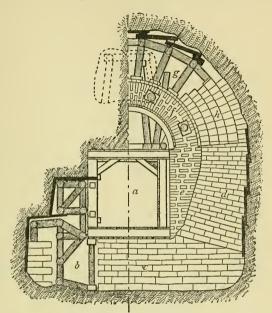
CROSS SECTION SHOWING STAGES IN CONSTRUCTION OF TUNNEL AT 4,400 KM., OR 2 MILES 1,292 YARDS.
